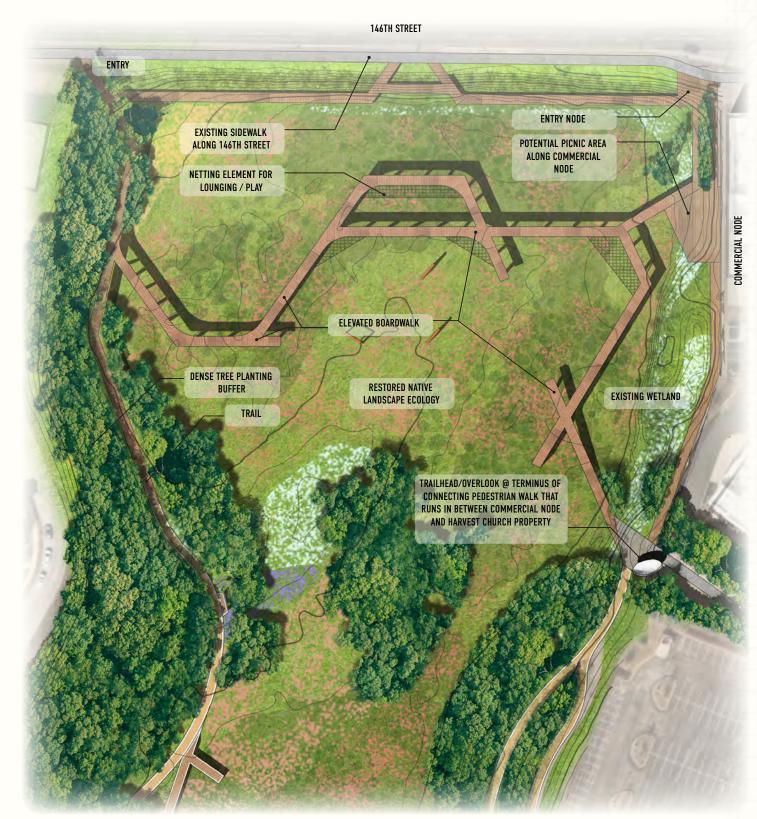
Elevated Boardwalk at 146th Street Enlarged Plan
